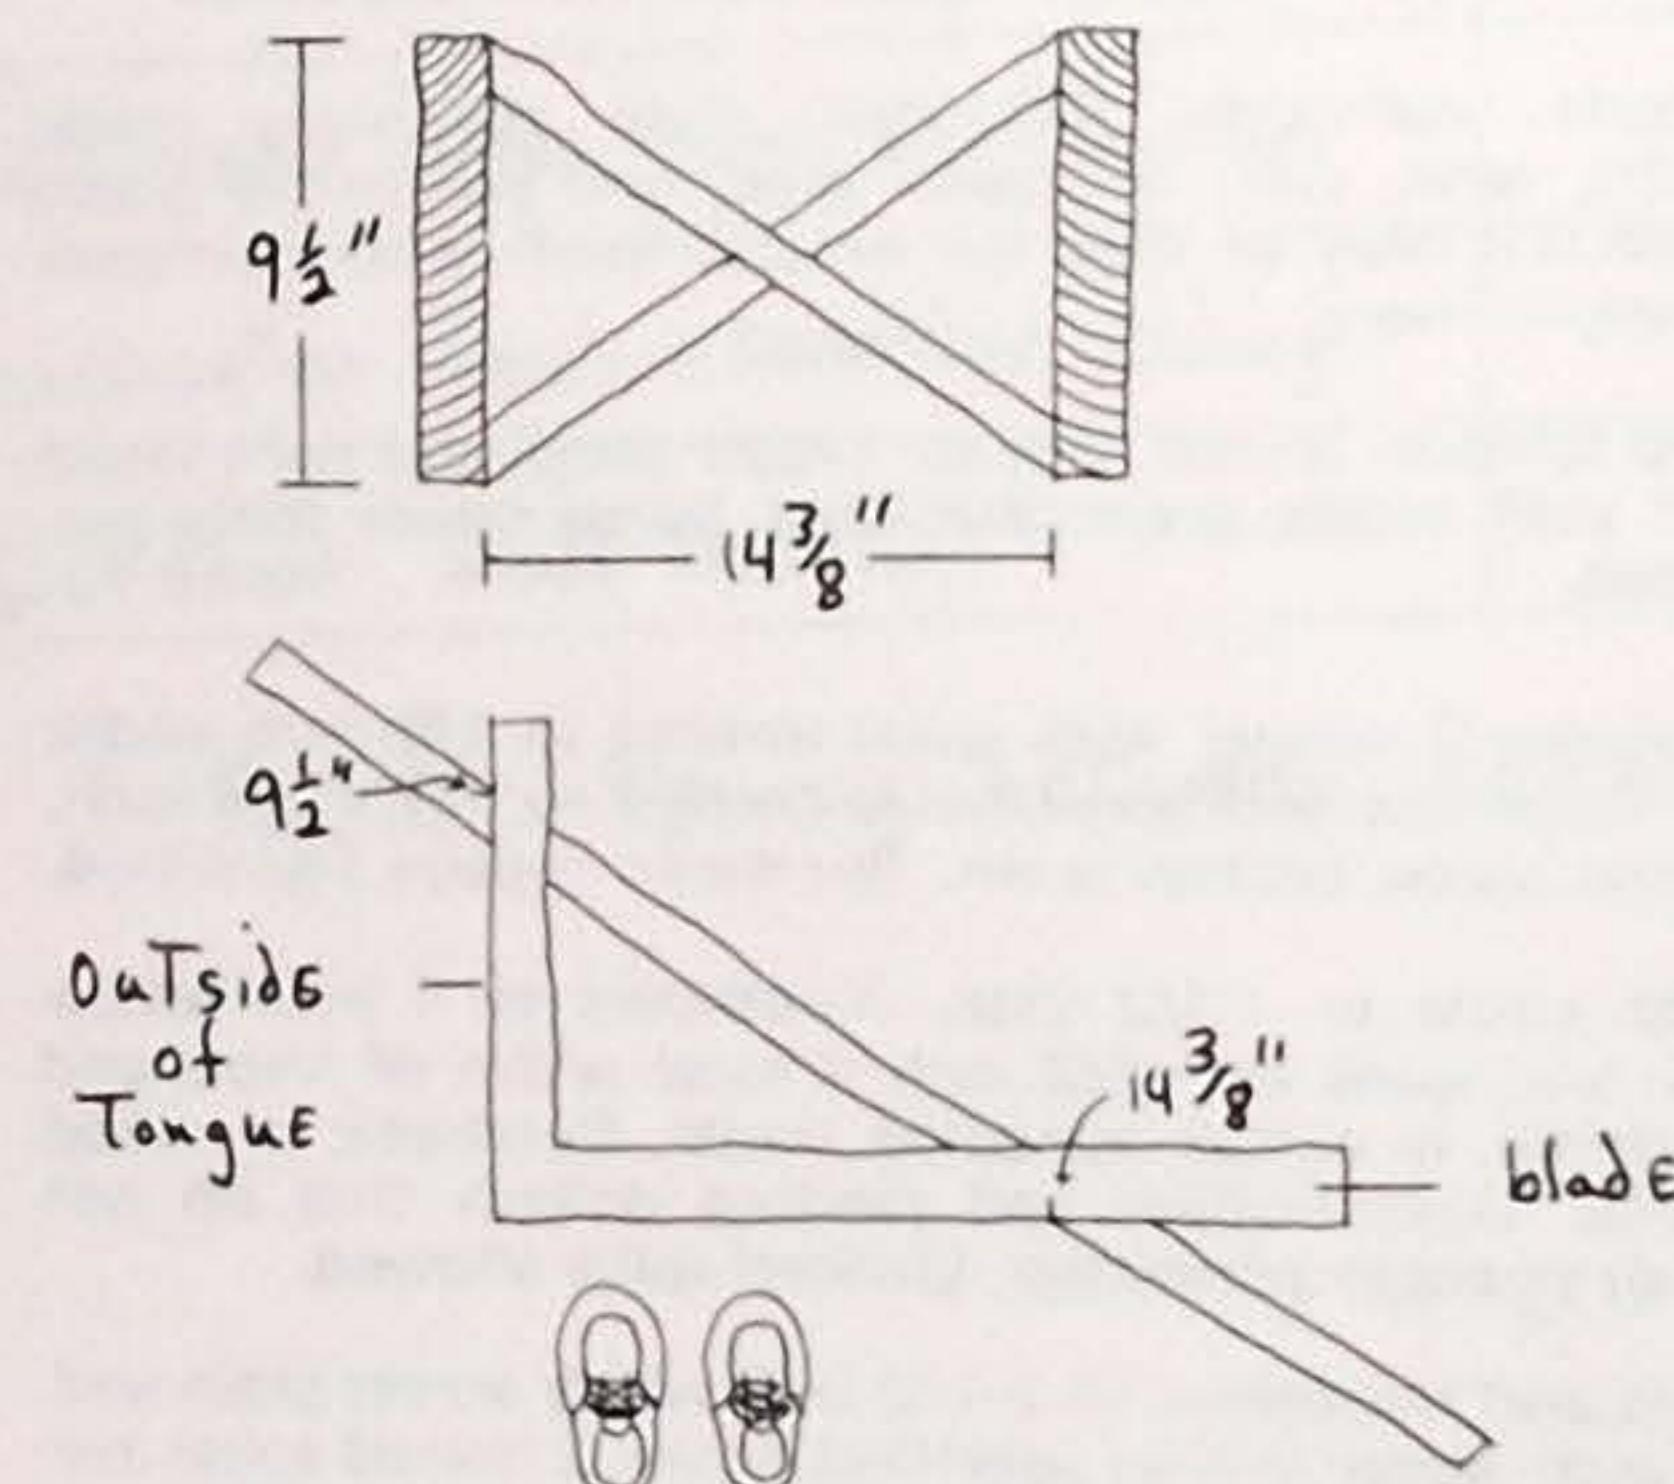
Laying OUT The Angle Cuts on X Bridging
